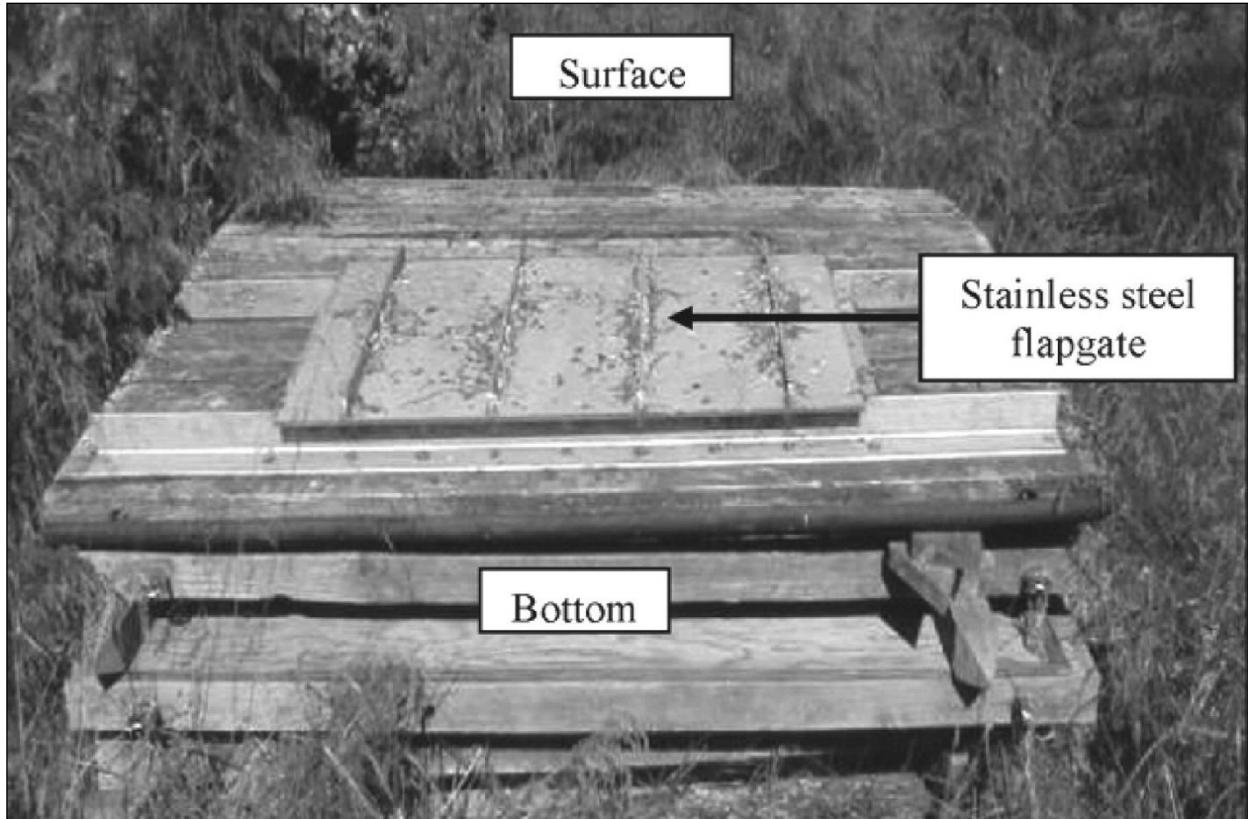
Photograph of a wooden stop block with stainless steel flapgate which were installed in 1989 (Rulifson and Wall 2006).
